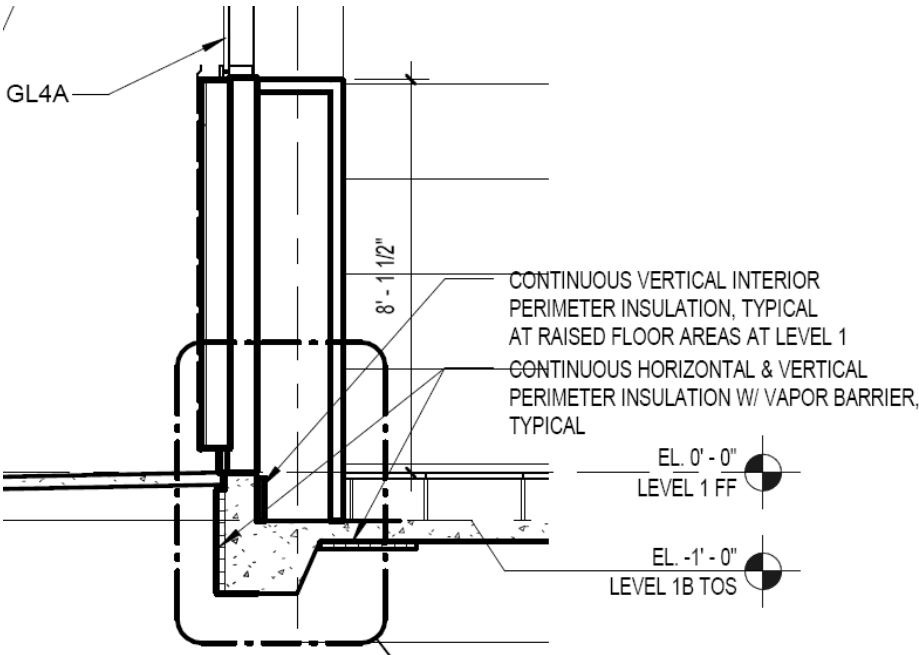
West Facade Wall Section - Detail 2 on Drawing A502
